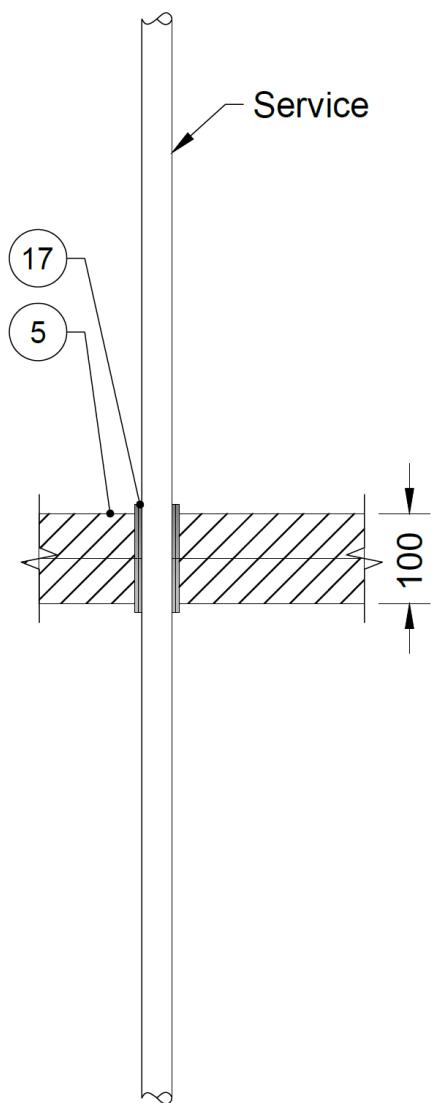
Section View of Pipes Installed in Horizontal Substrates
